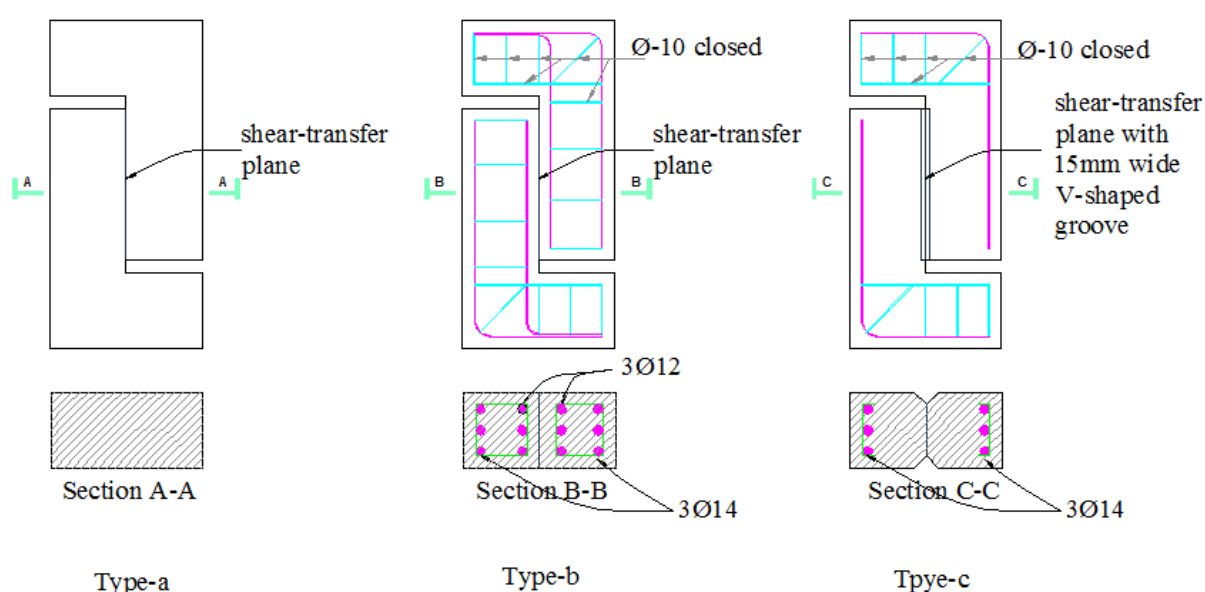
2: Arrangement of reinforcement on the head and side of specimen
